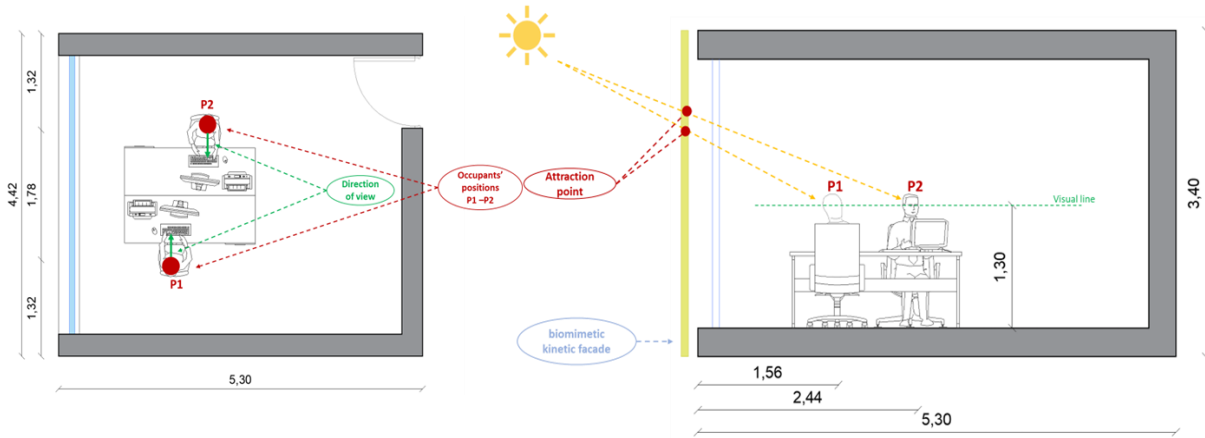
Test room as an office building with occupant positions, direction of view, and attraction point. Left: floor plan; right: section.
